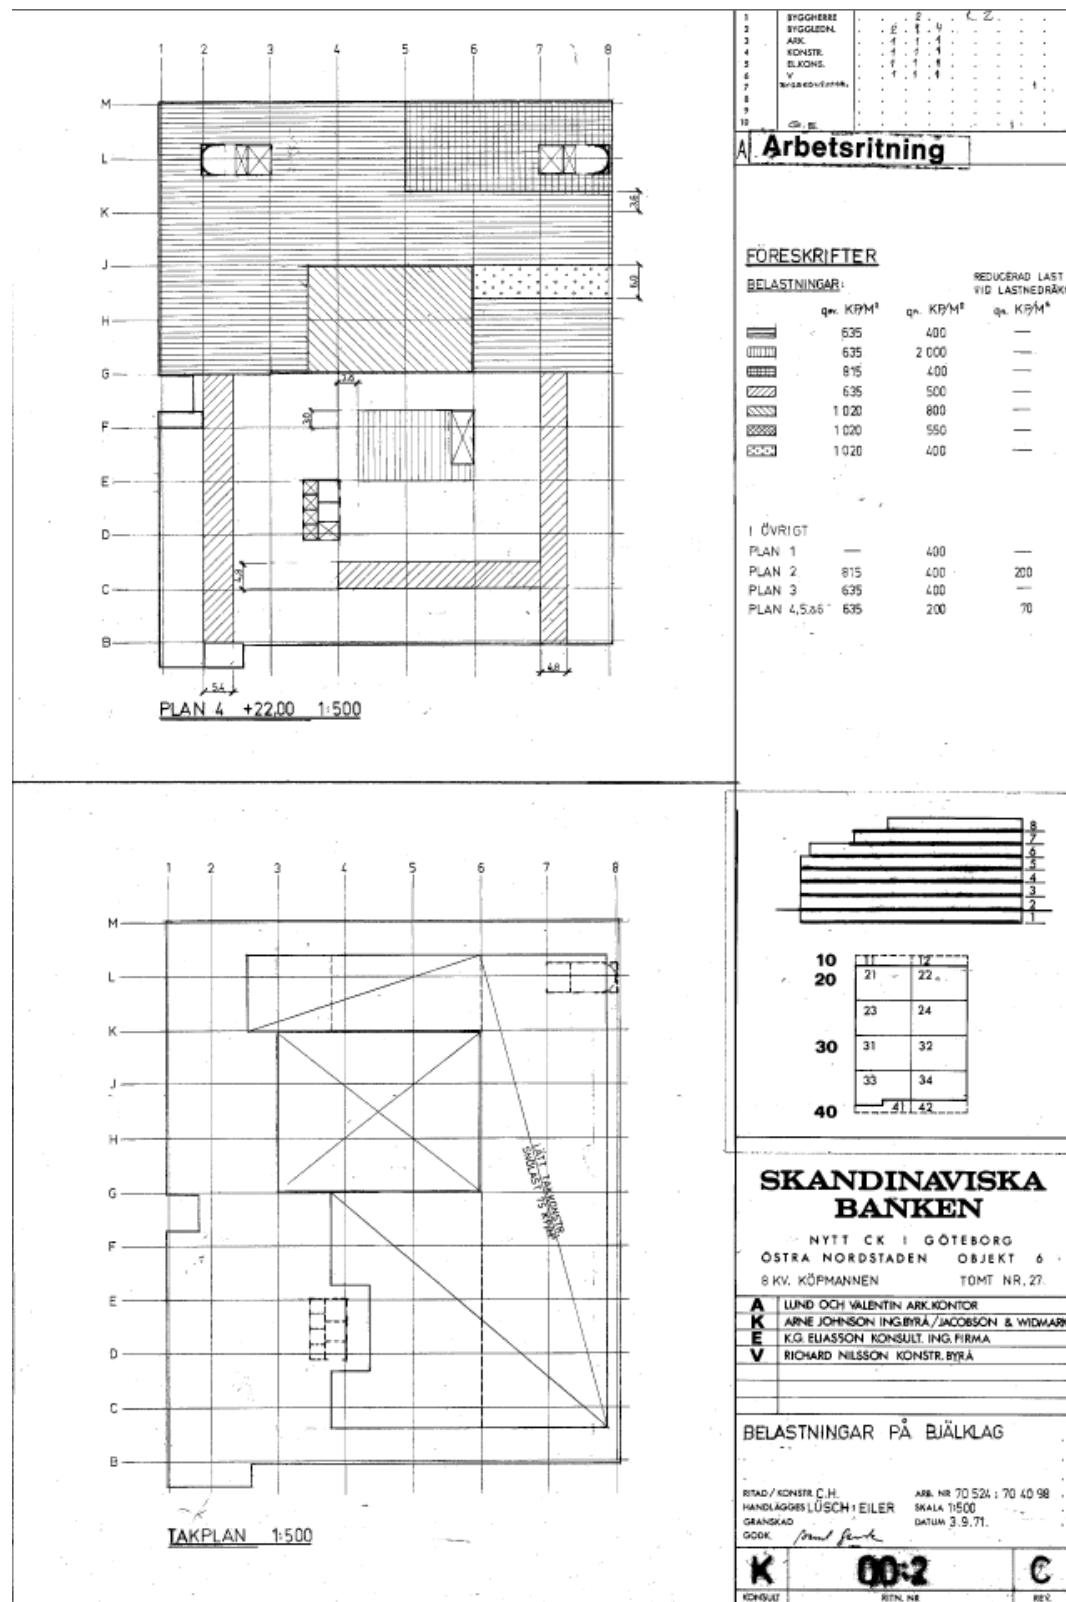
Loads acting on floor 4 and roof as well as the magnitude of loads.
